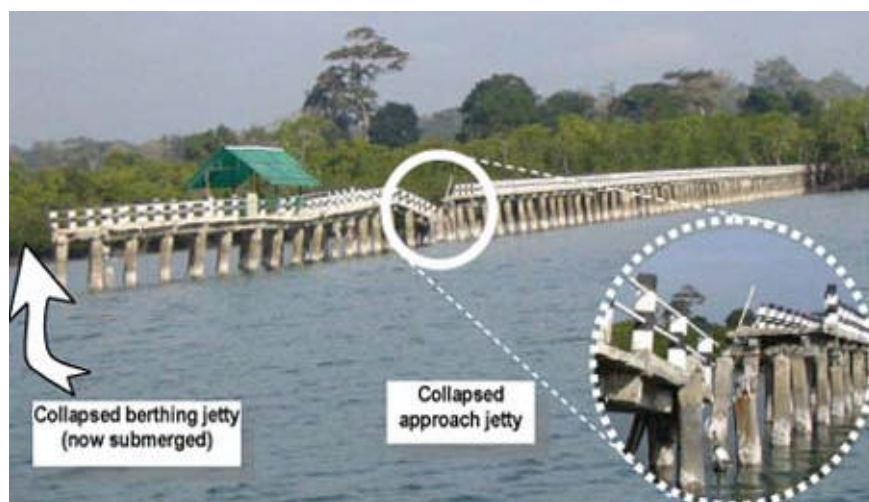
Gandhinagar Jetty in North Andaman: Total collapse of berthing jetty and partial collapse of approach jetty.
